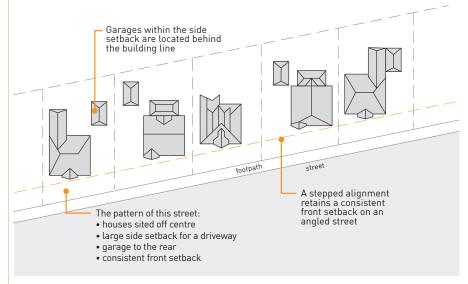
C.2-1: Retain the streetscape pattern of building siting.
